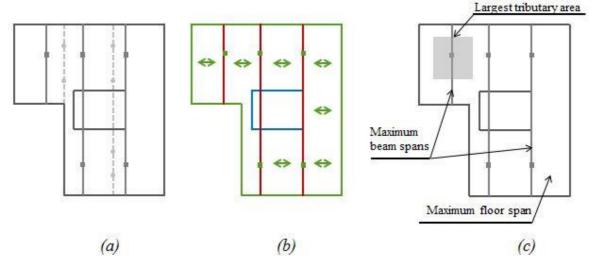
Floor plans of Concept 6, (a) Dashed lines are showing the beam-column lines in the reference building, while the solid lines are showing the beam-column lines used in the first iteration of Concept 6. (b) Floor plan that shows what materials that were used, green stands for timber, blue for concrete and red for steel. (c) Presents information like the maximum span and largest tributary area.
